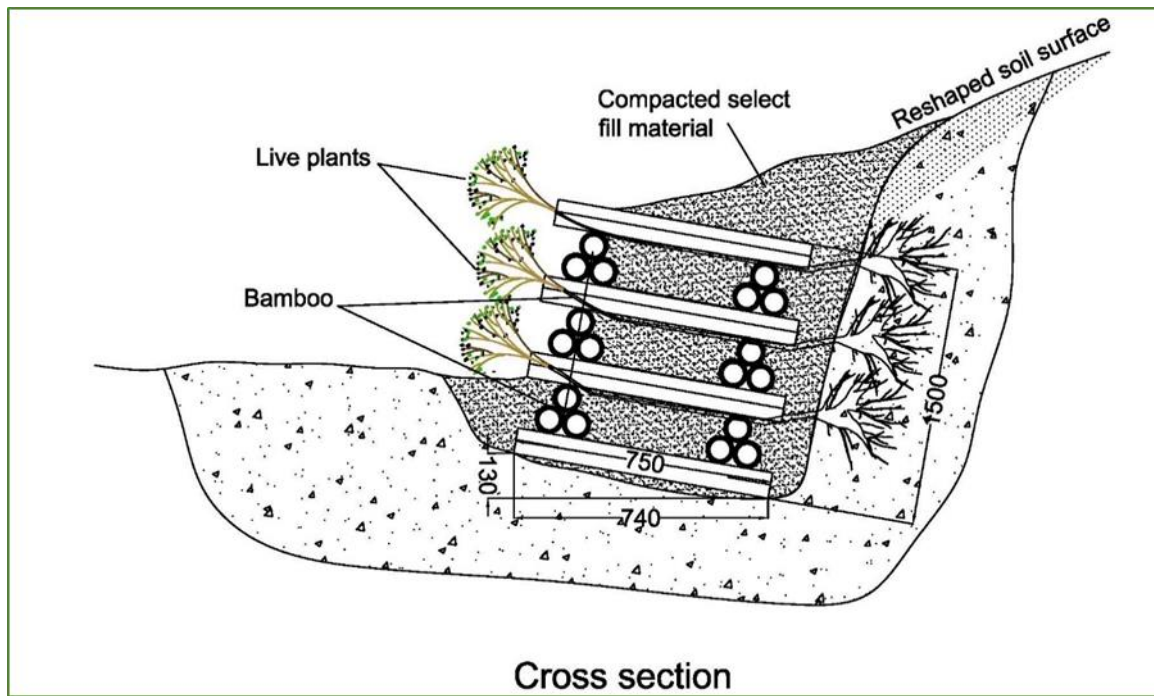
A Vegetated Crib Wall made up of bamboo
